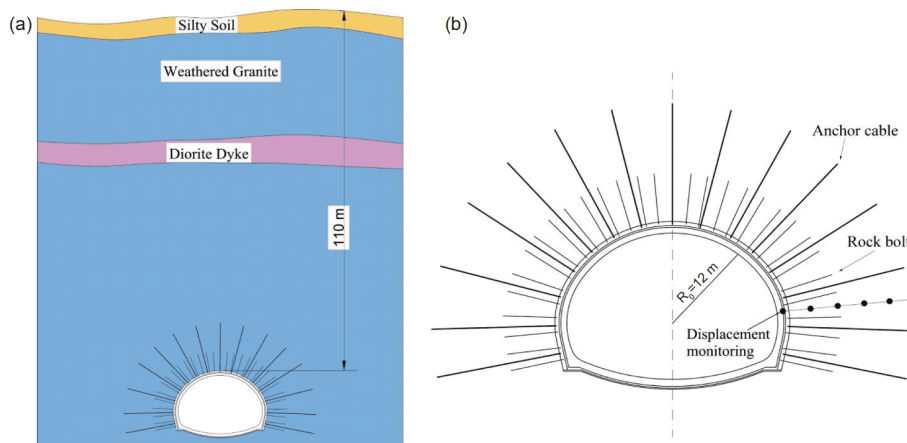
(Color online) Study section of Great Wall Station Tunnel in Beijing. (a) Geology conditions; (b) tunnel section and field measuring detail.
